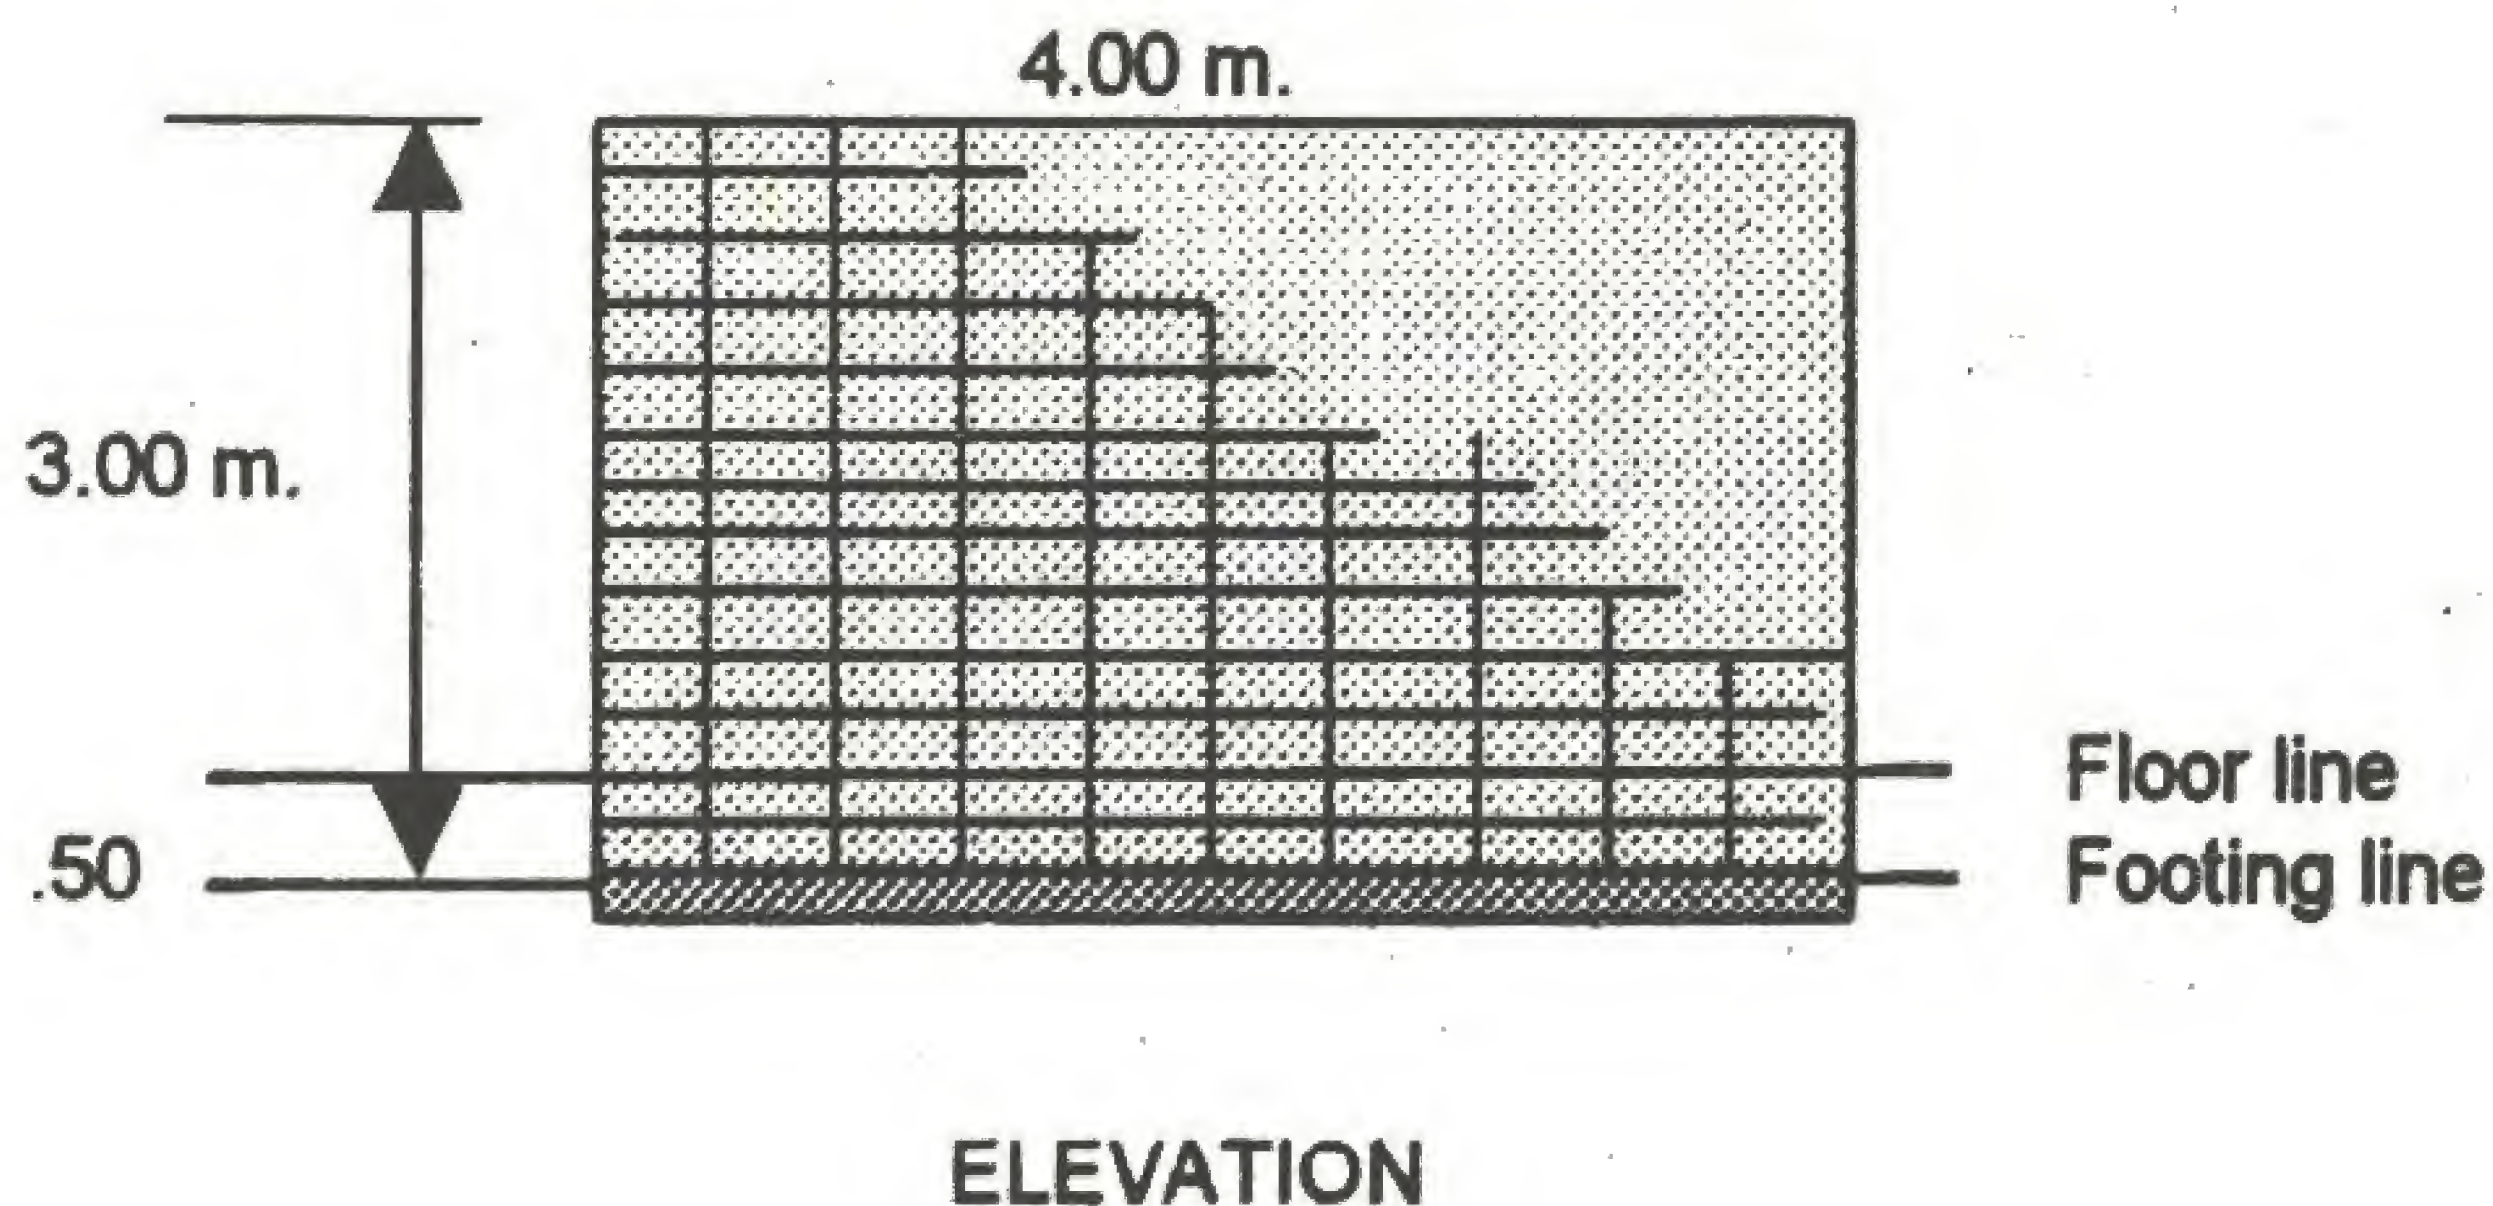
CONCRETE HOLLOW BLOCKS WALL
